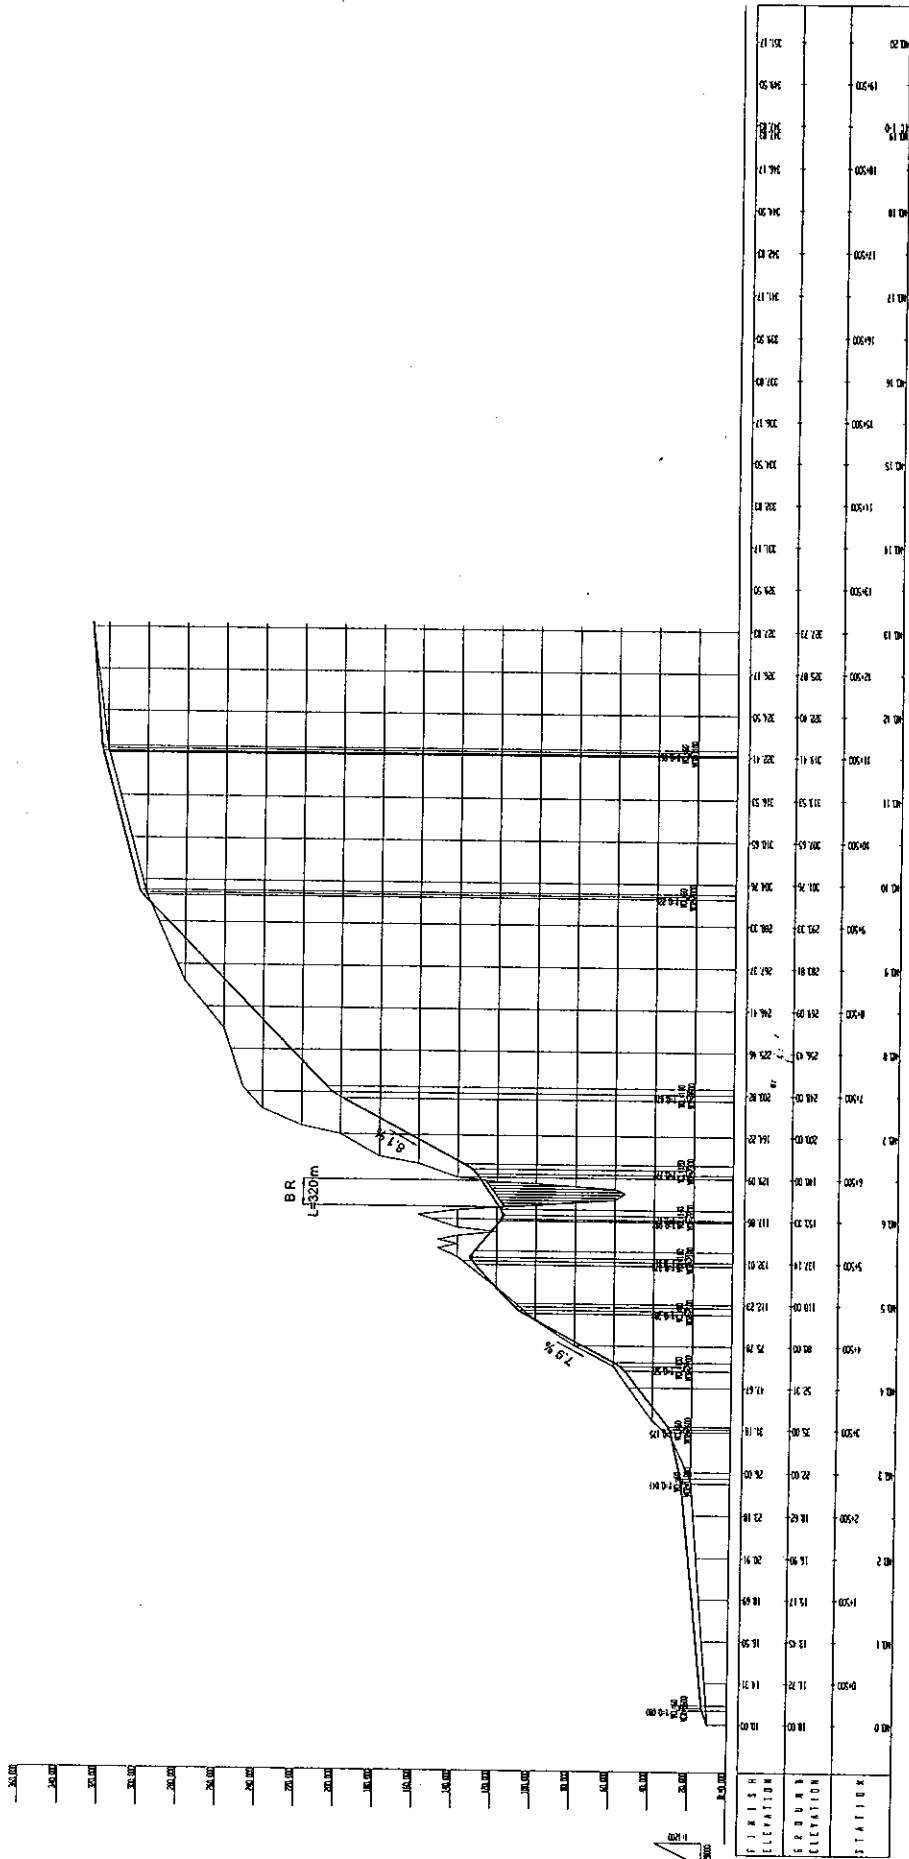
(3/5) MINDANAO CONTAINER TERMINAL - BUKIDNON LINK ROAD: PROFILE OF ALTERNATIVE E-2
